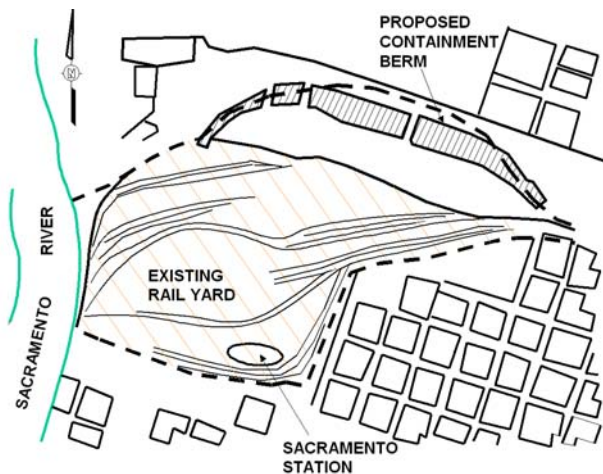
Sacramento Rail Yard site plan showing existing track locations and proposed containment berm. The relocated rail lines would pass along the top of the berm.
